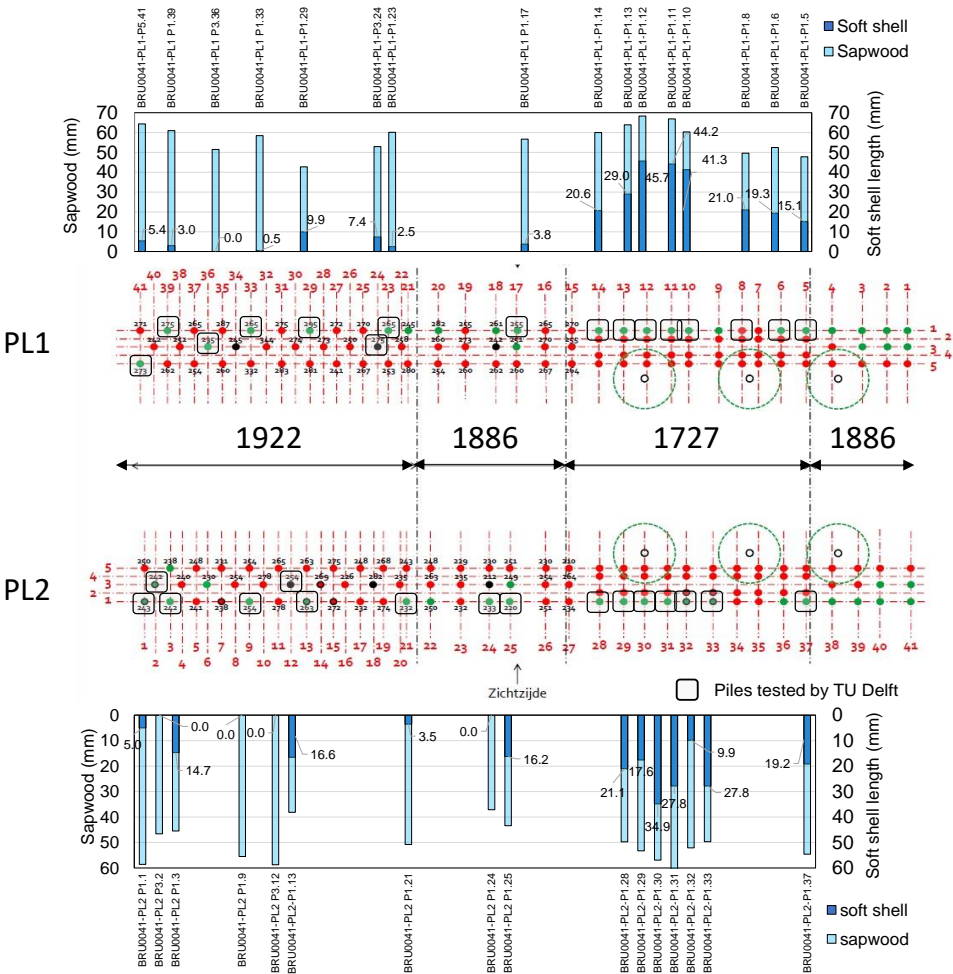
Bridge 41: overview of soft shell and sapwood of the head of the piles in the foundation plan.
